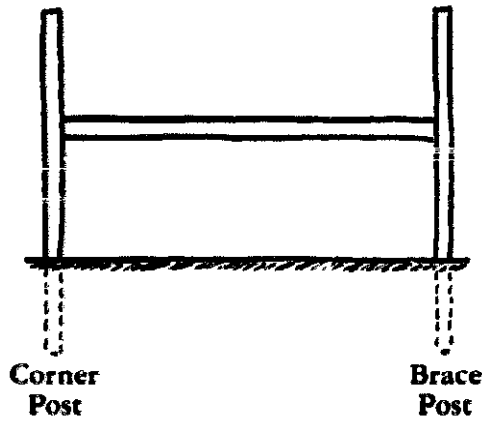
Bracing a corner post with a single horizontal strut.
